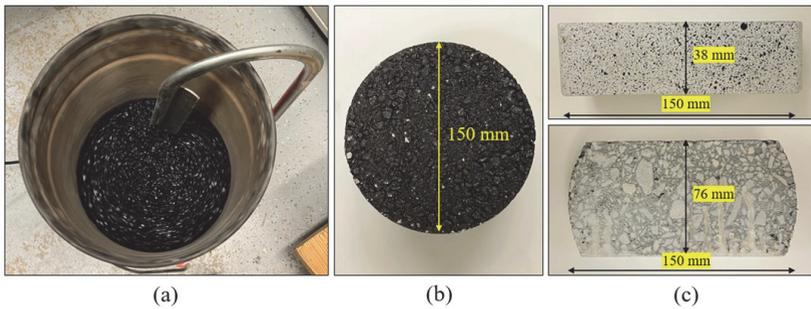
Sample preparation: (a) mixing of aggregate and binder; (b) compacted specimen; and (c) final brick-shaped specimen for cross-shear testing.
